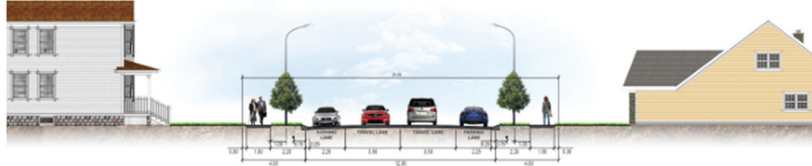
24.0m Undivided Collector Roadway Cross-Section
